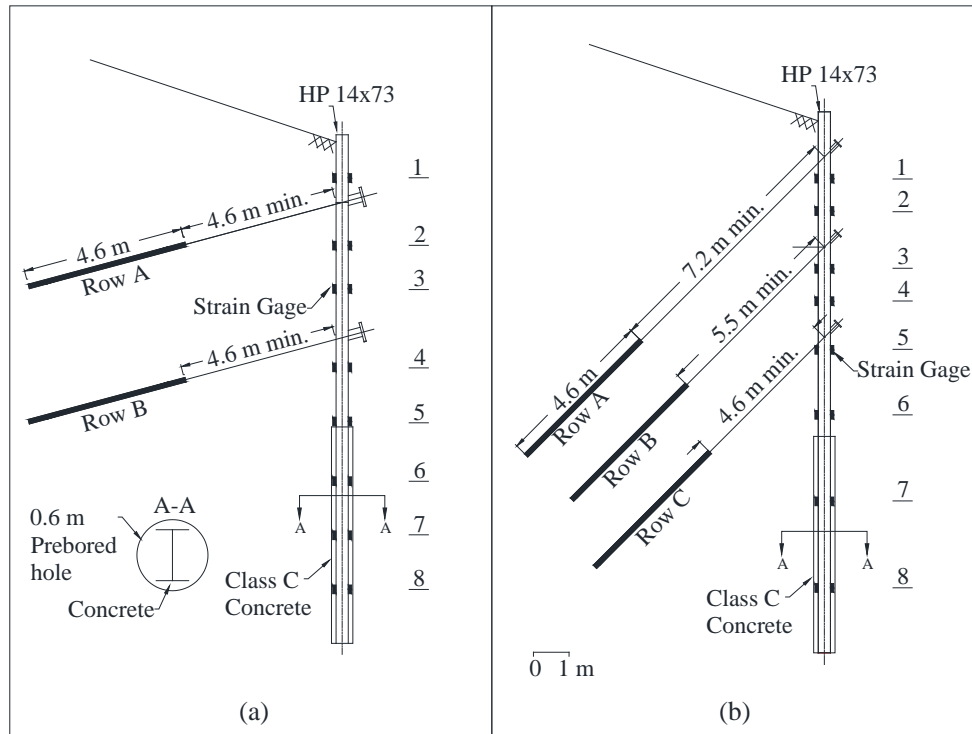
Strain gages location: (a) Lower wall; (b) Upper wall
